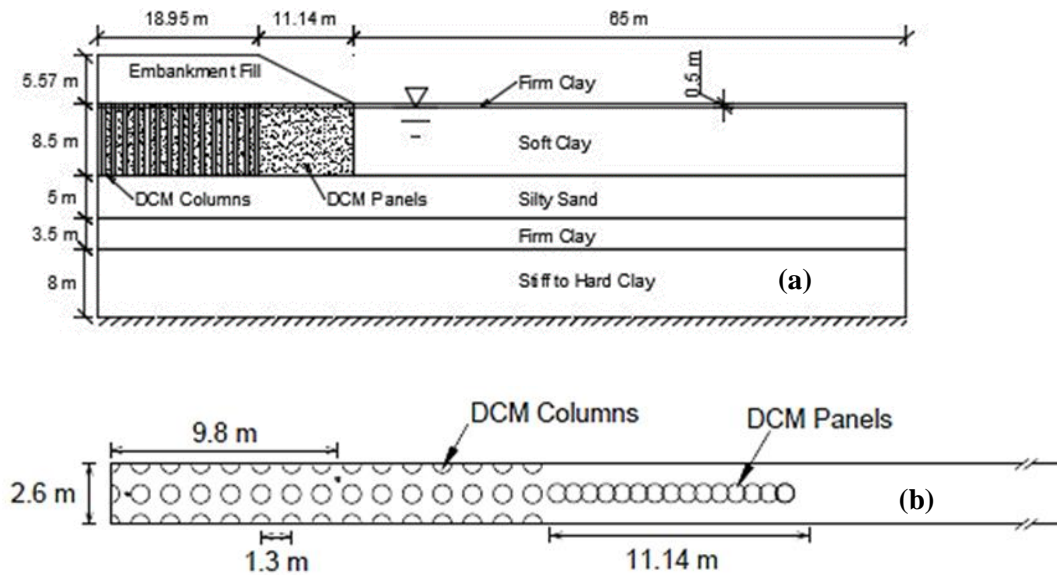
Geometry of the improved embankment and ground conditions (a) Section view (b) Plan view (enlarged to improve clarity of column configuration)
